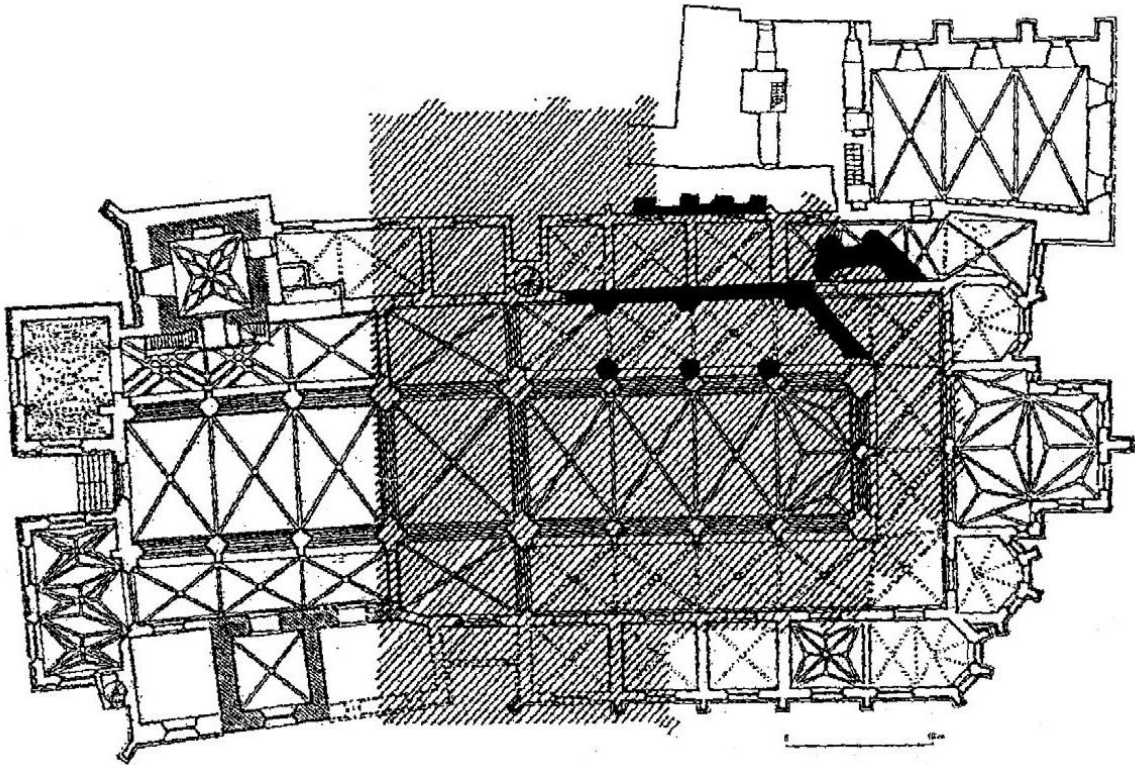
Kraków, remains of the foundation walls of the choir started around 1300.
